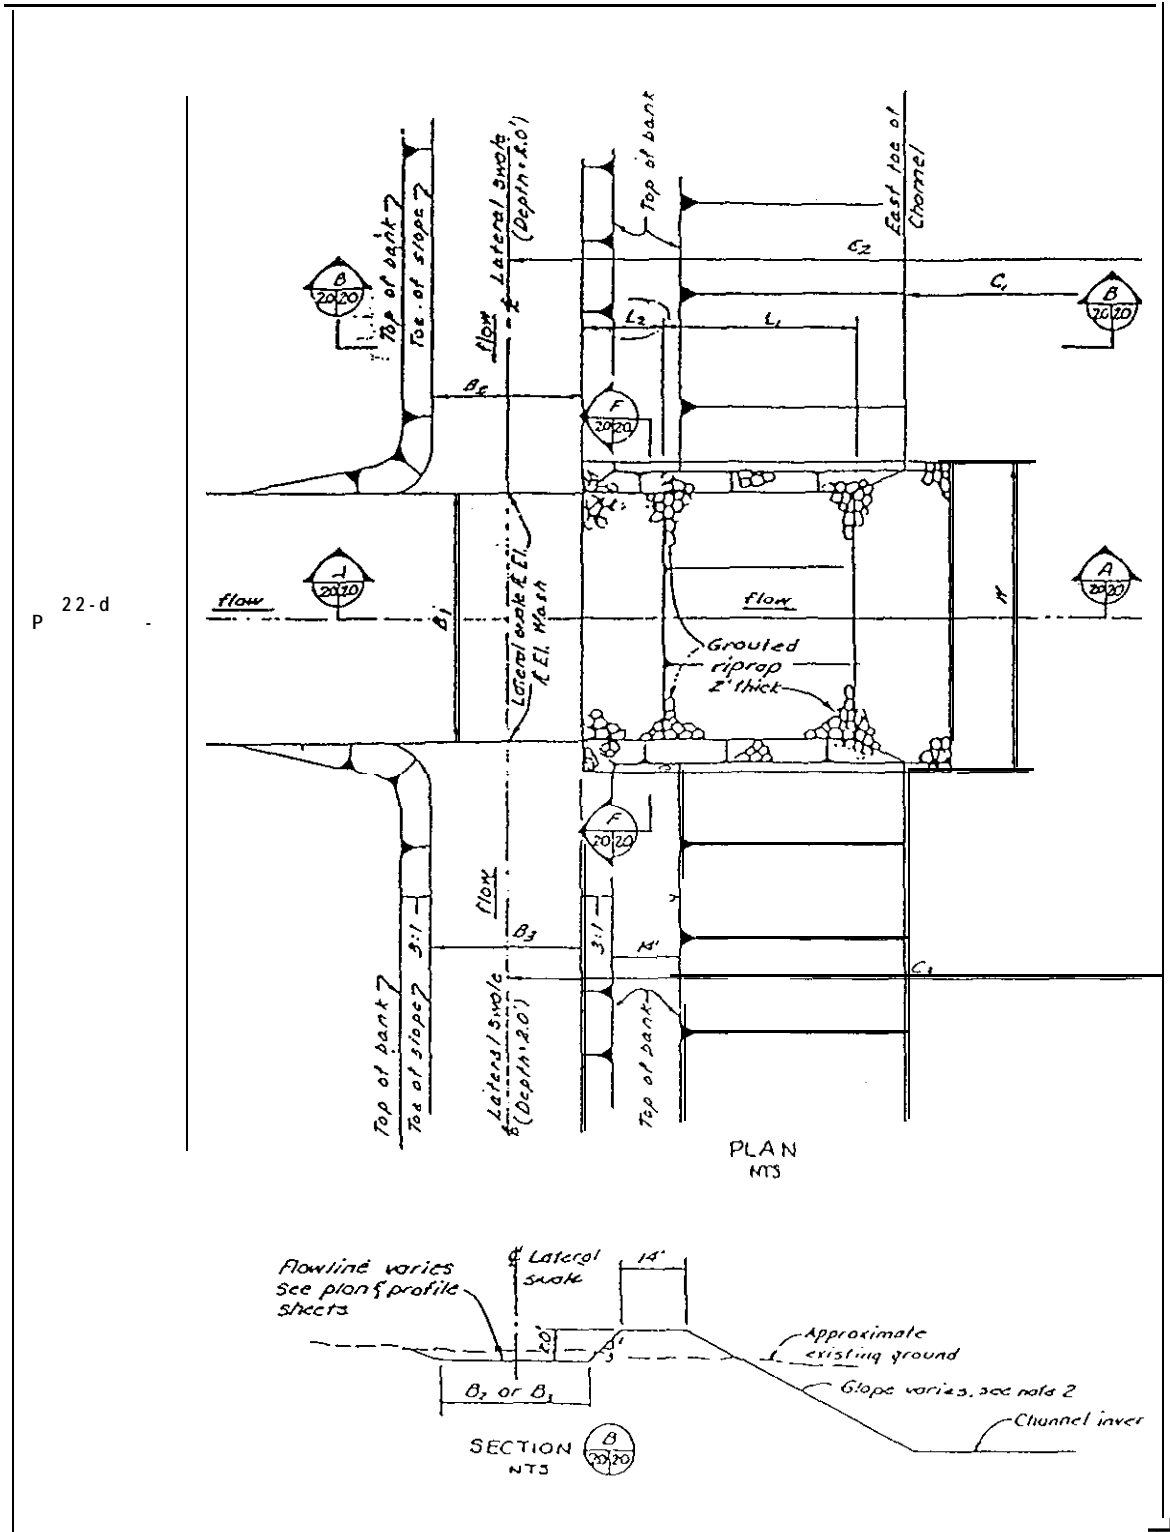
As-Built Drawing: Collector Channel and Side Weir
